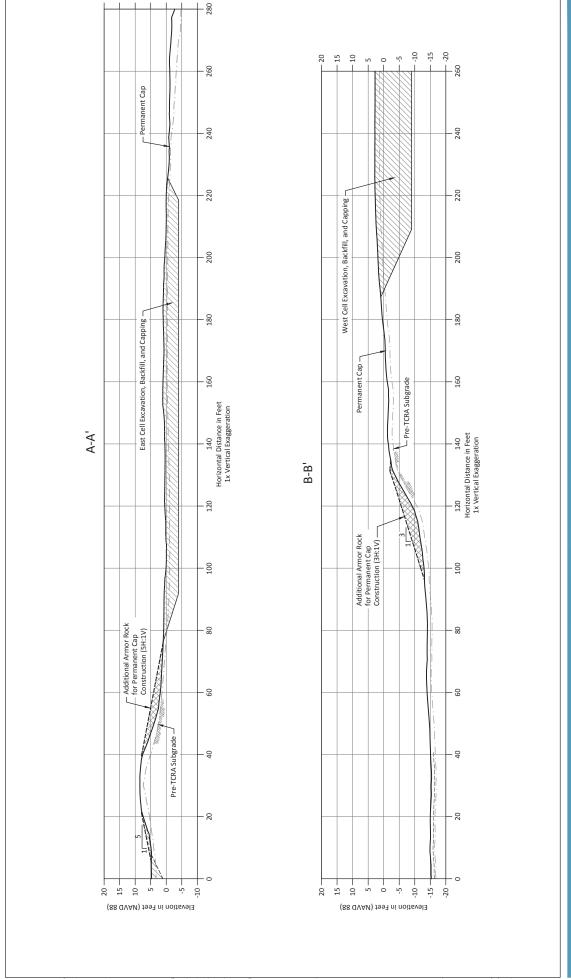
Cross Sections A-A' and B-B' - Alternative 5N Feasibility Study San Jacinto River Waste Pits Superfund Site
